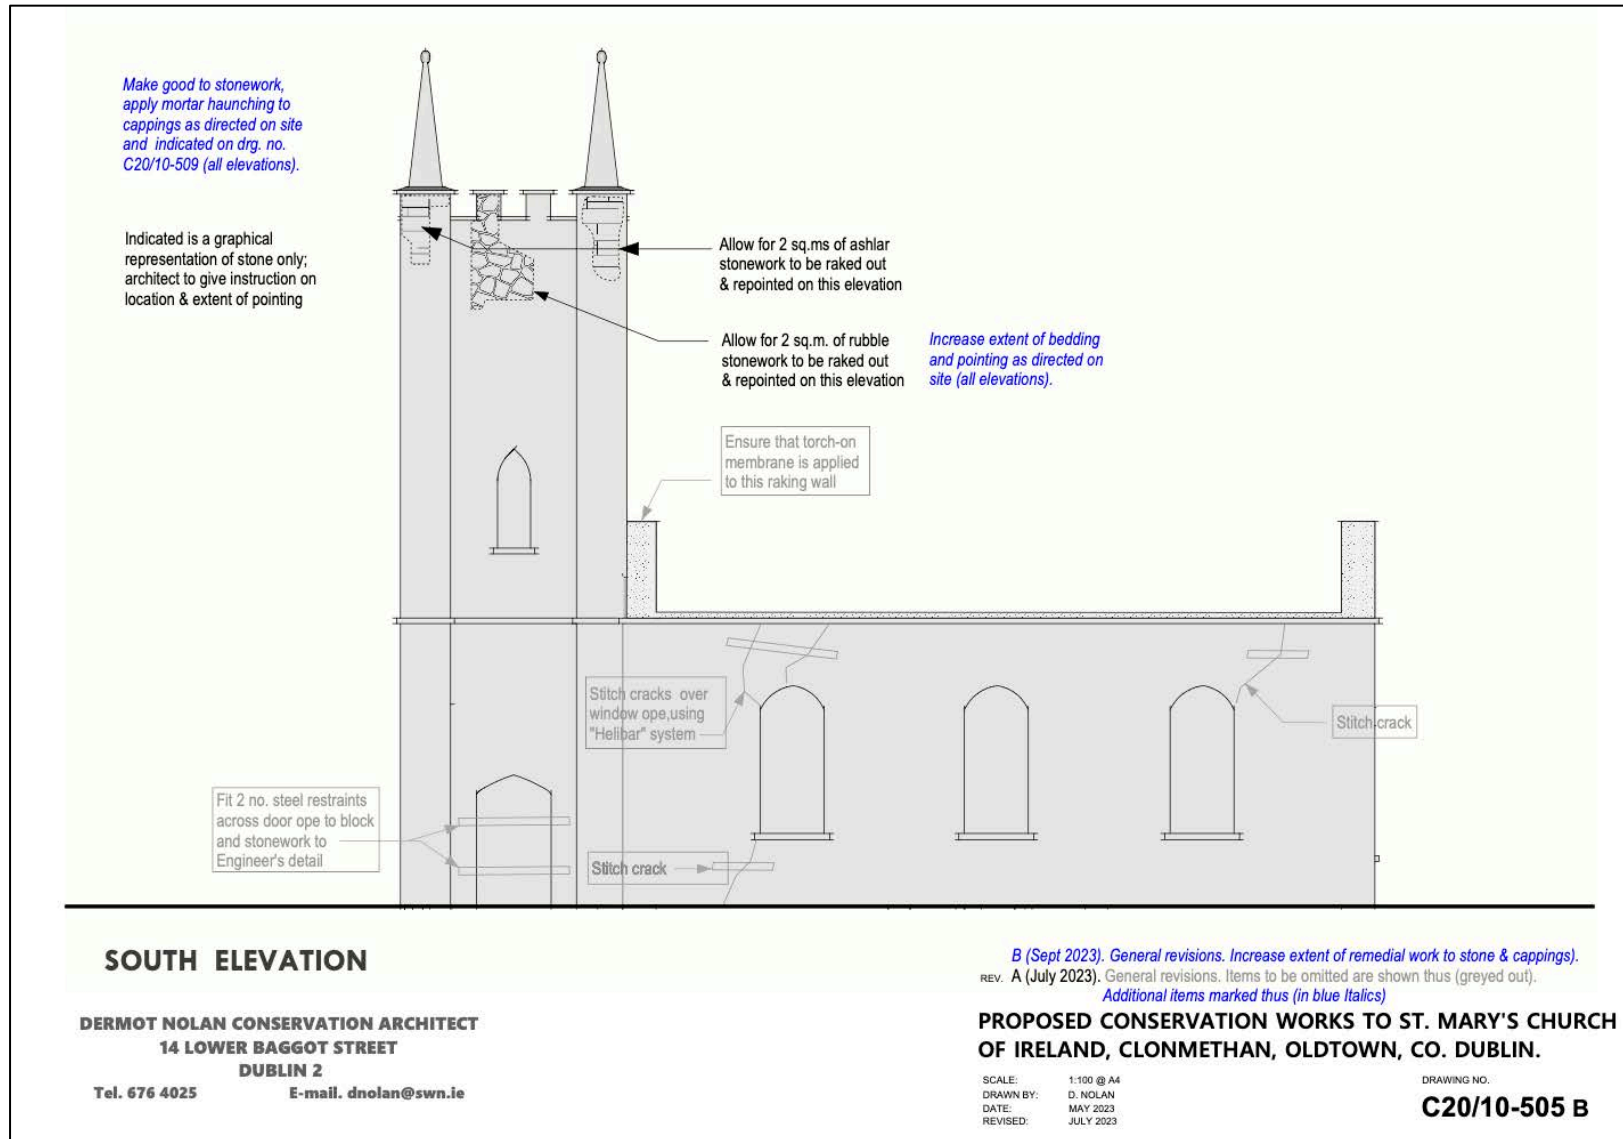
South elevation with details of conservation interventions (Nolan 2023a).
